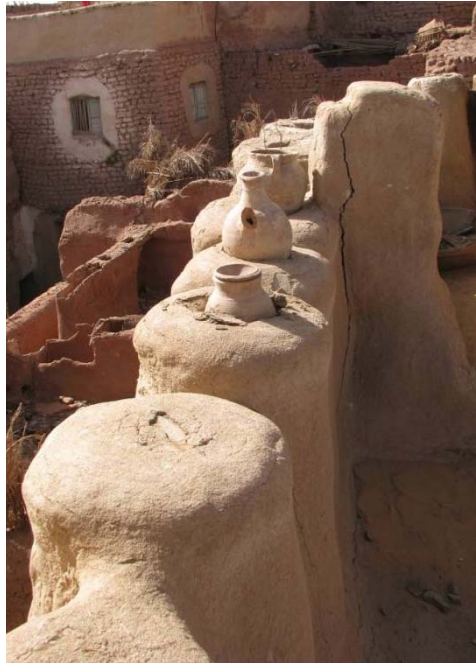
Another example of mud pots for storage of grain on the roof floor.
